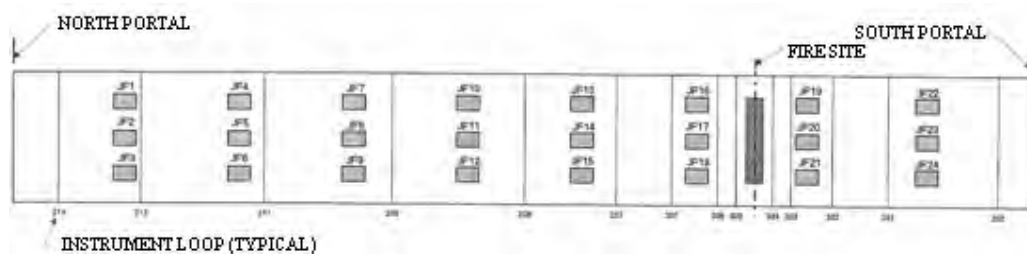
Tunnel plan showing jet fans arrangement (reproduced from Bechtel and Brinckerhoff (1995))
